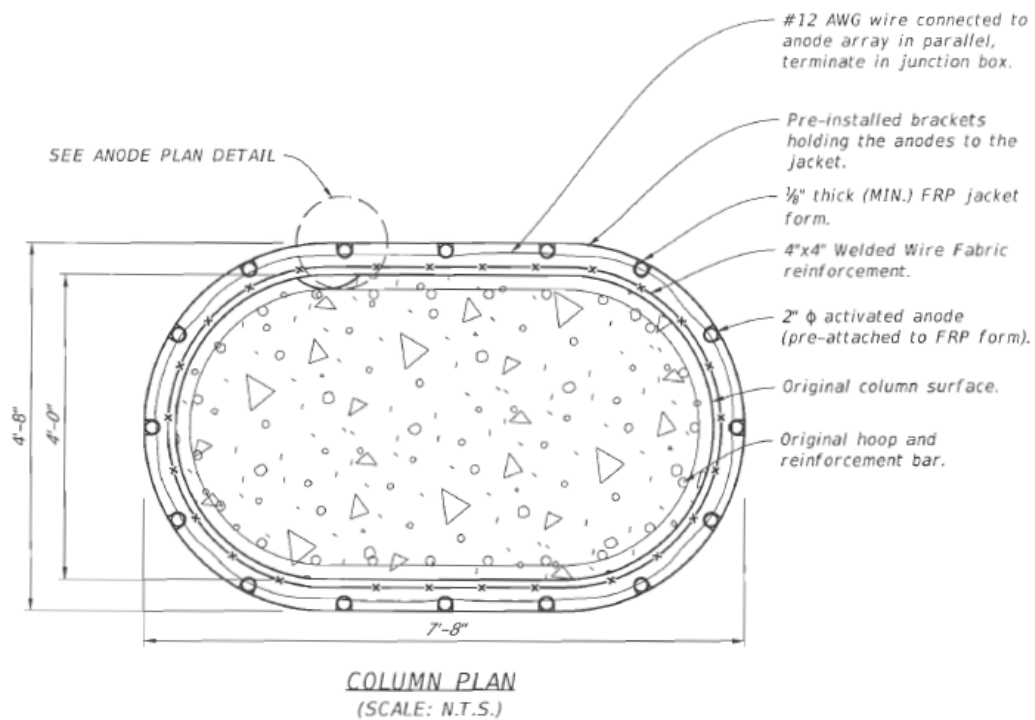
Cross Section of Lake Worth Galvanic Jackets
